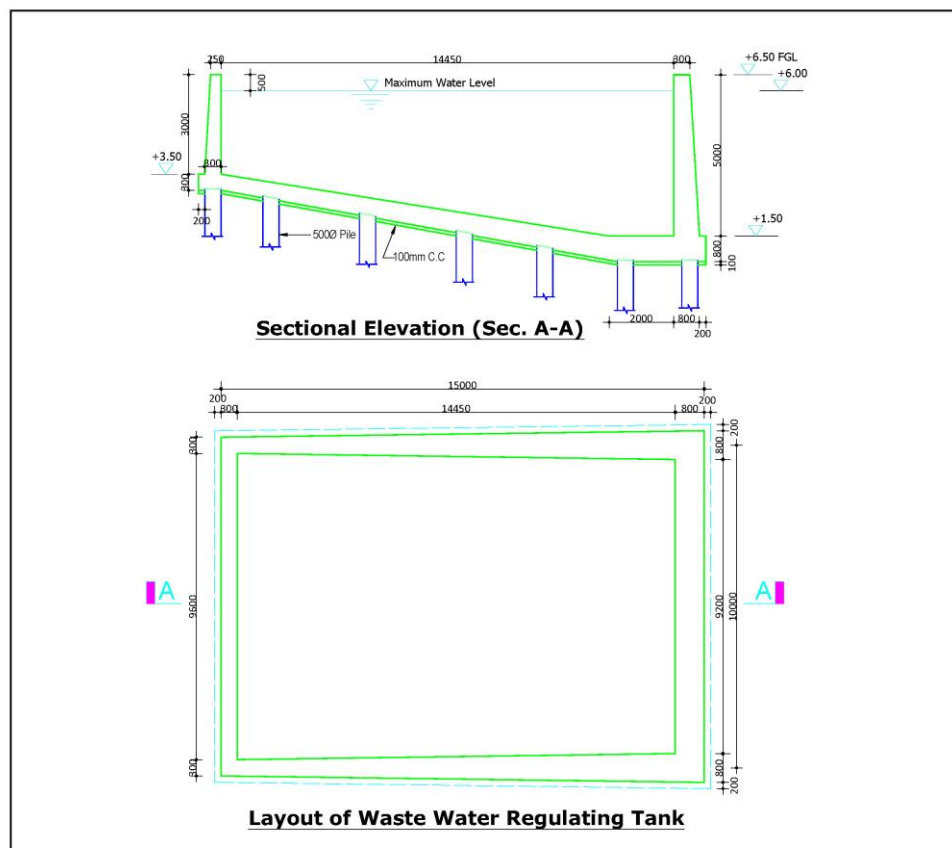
Plan and Section of Wash Water Regulating Tank
